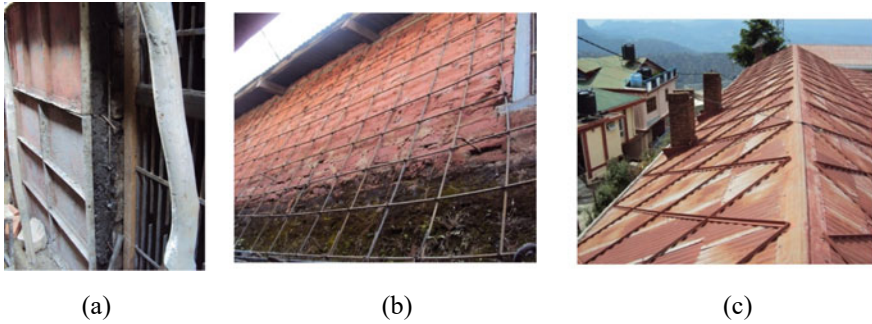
a, b RCC wall both inside and outside c Roof truss with cross-bracings
